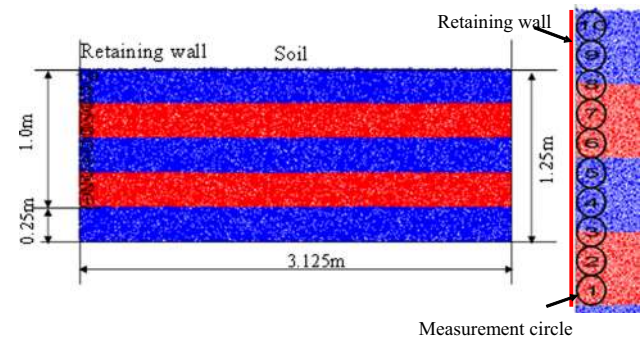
DEM model of the retaining wall with the layout of measurement circles
